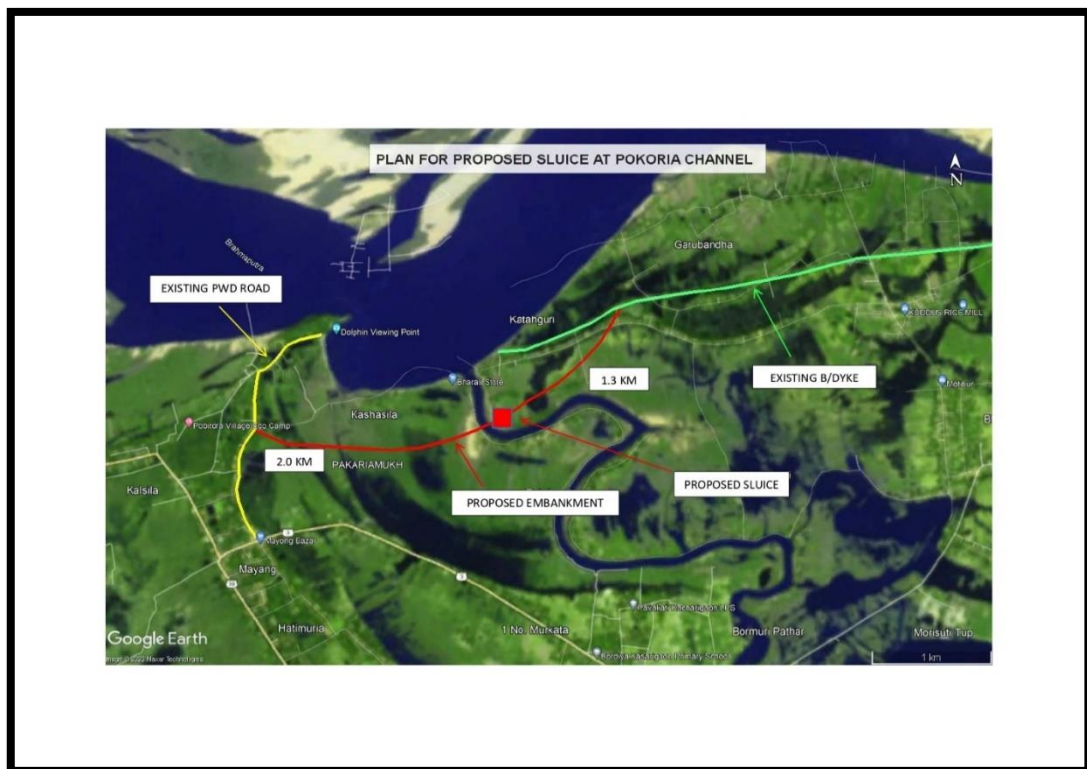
Plan for proposed Sluice at Pokoria Channel
